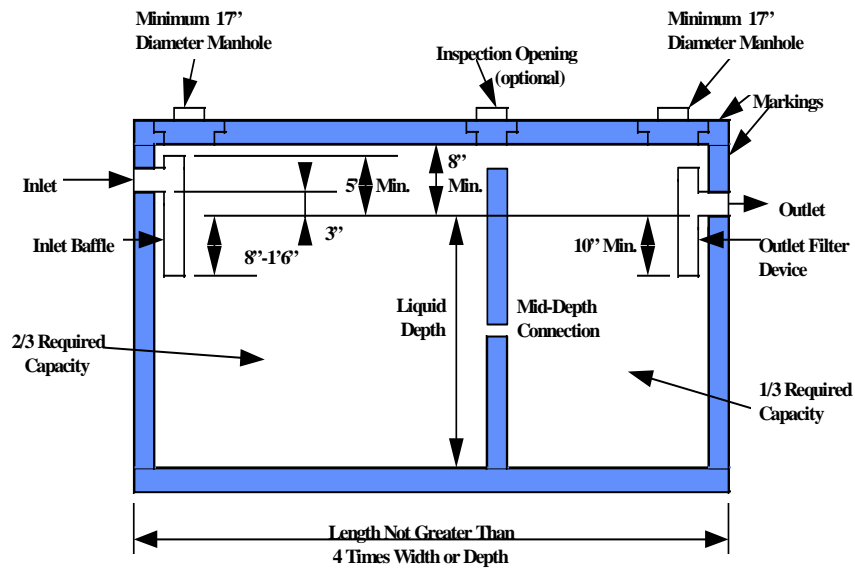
TYPICAL SEPTIC TANK
